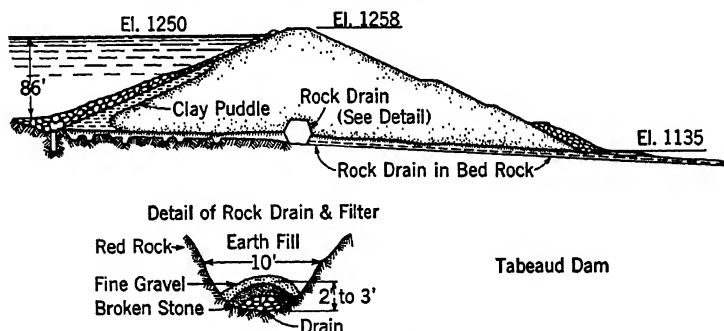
Tabeaud Dam, California, showing drainage measures adopted (1902).
